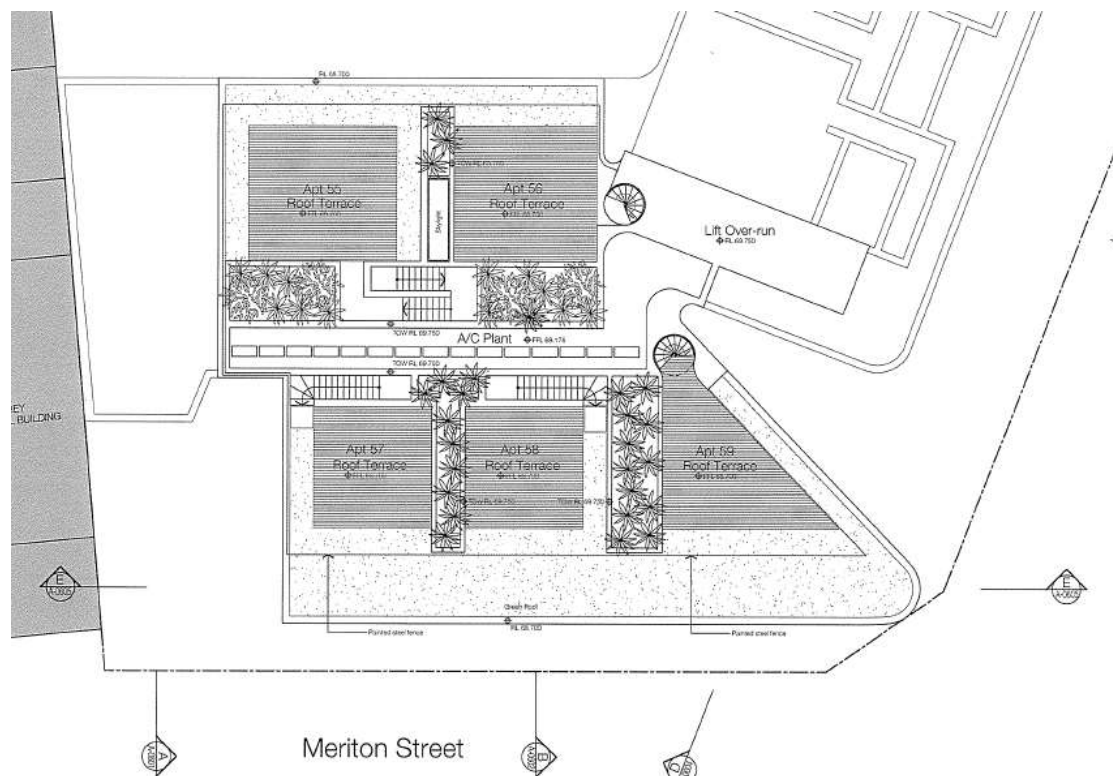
Roof Plan (Source: DA drawing A-0210/10)
